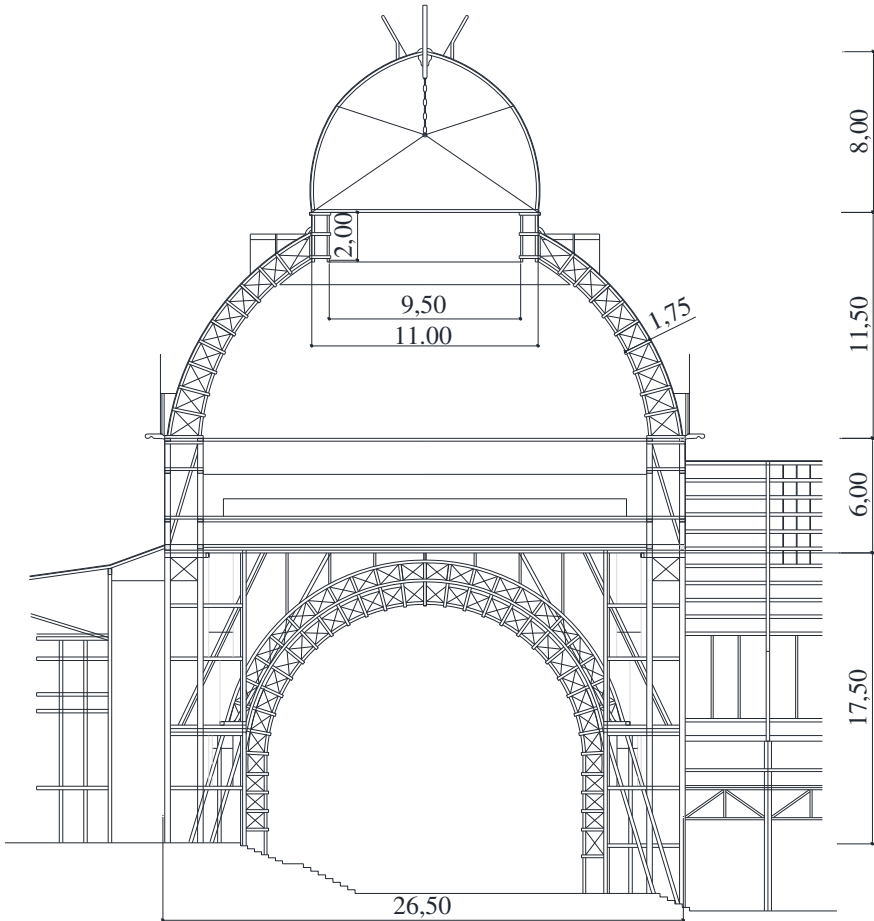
The dome of a temporary facility in Copenhagen was built in 1888 [13]
